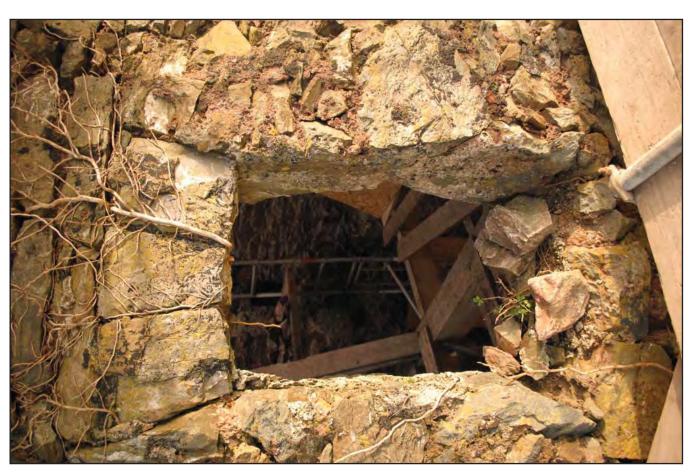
2nd storey window detailing stone voussoirs. Photograph taken from the south east
